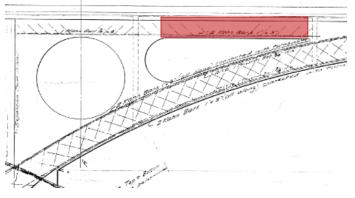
Typical arch elevation showing the longitudinal spandrel members over the teardrop openings from the original design plans (highlighted red).
